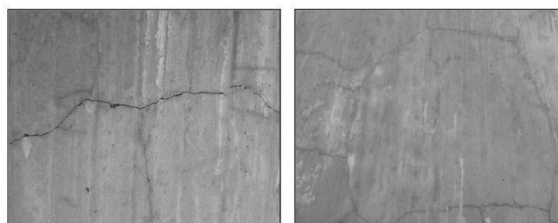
Case of break occurrence within the LMC bridge deck pavement
